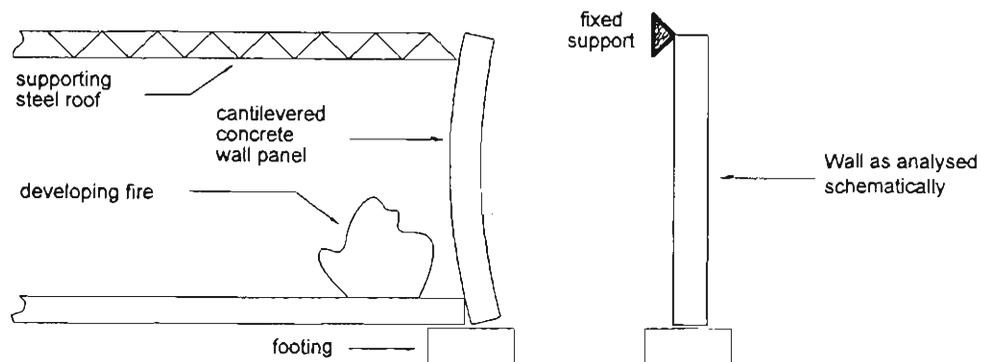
Behaviour of Cantilevered Concrete Wall in Tilt-Up Construction; (Gnanakrishnan, 1993)
